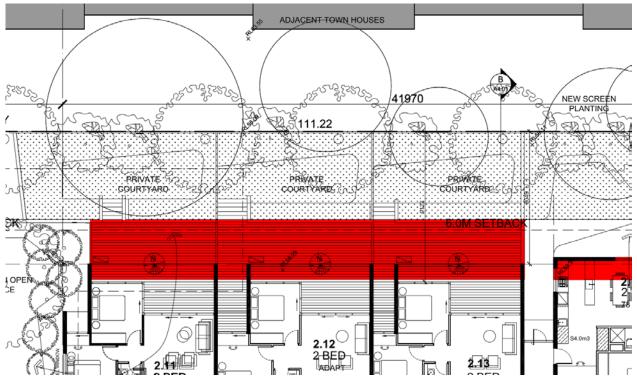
Annotated plan illustrating relationship between north facing ground floor units-Building B to adjoining townhouse courtyards. Red shading indicates area of non compliance with 9m setback. This element is up to 1.8m out of ground.
